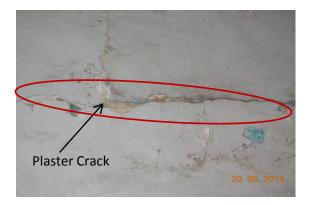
Plaster Crack on Wall No.3 of Shop No. 773-3, Ground Floor
